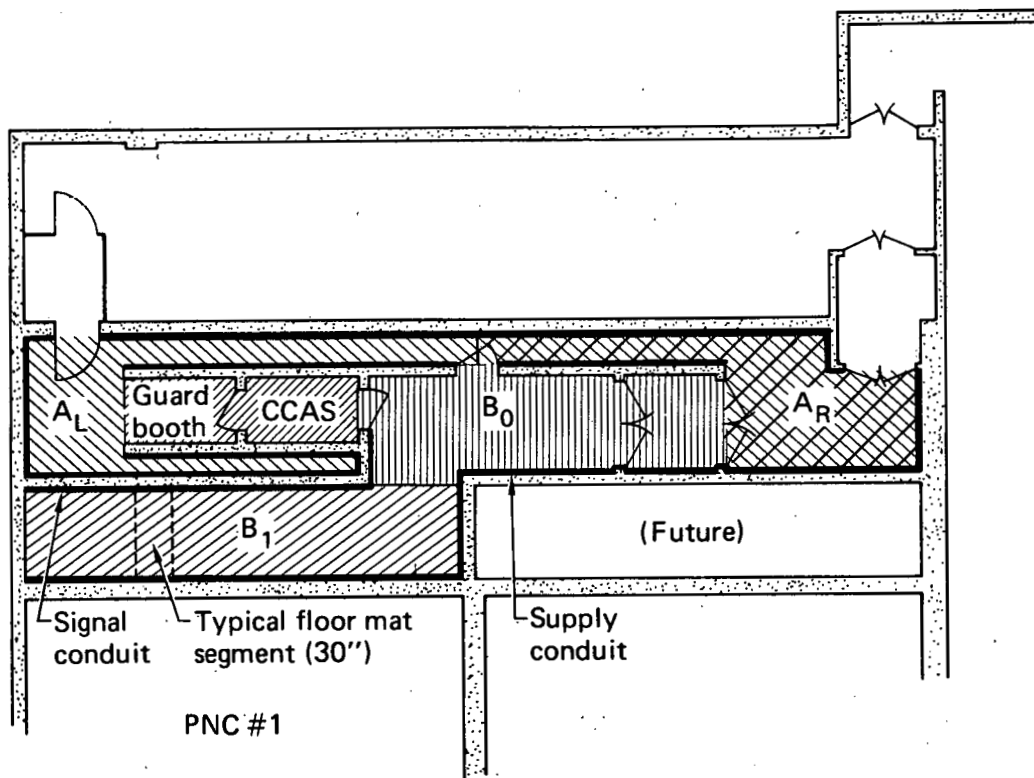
Floor Mat Signal and Supply Conduit
